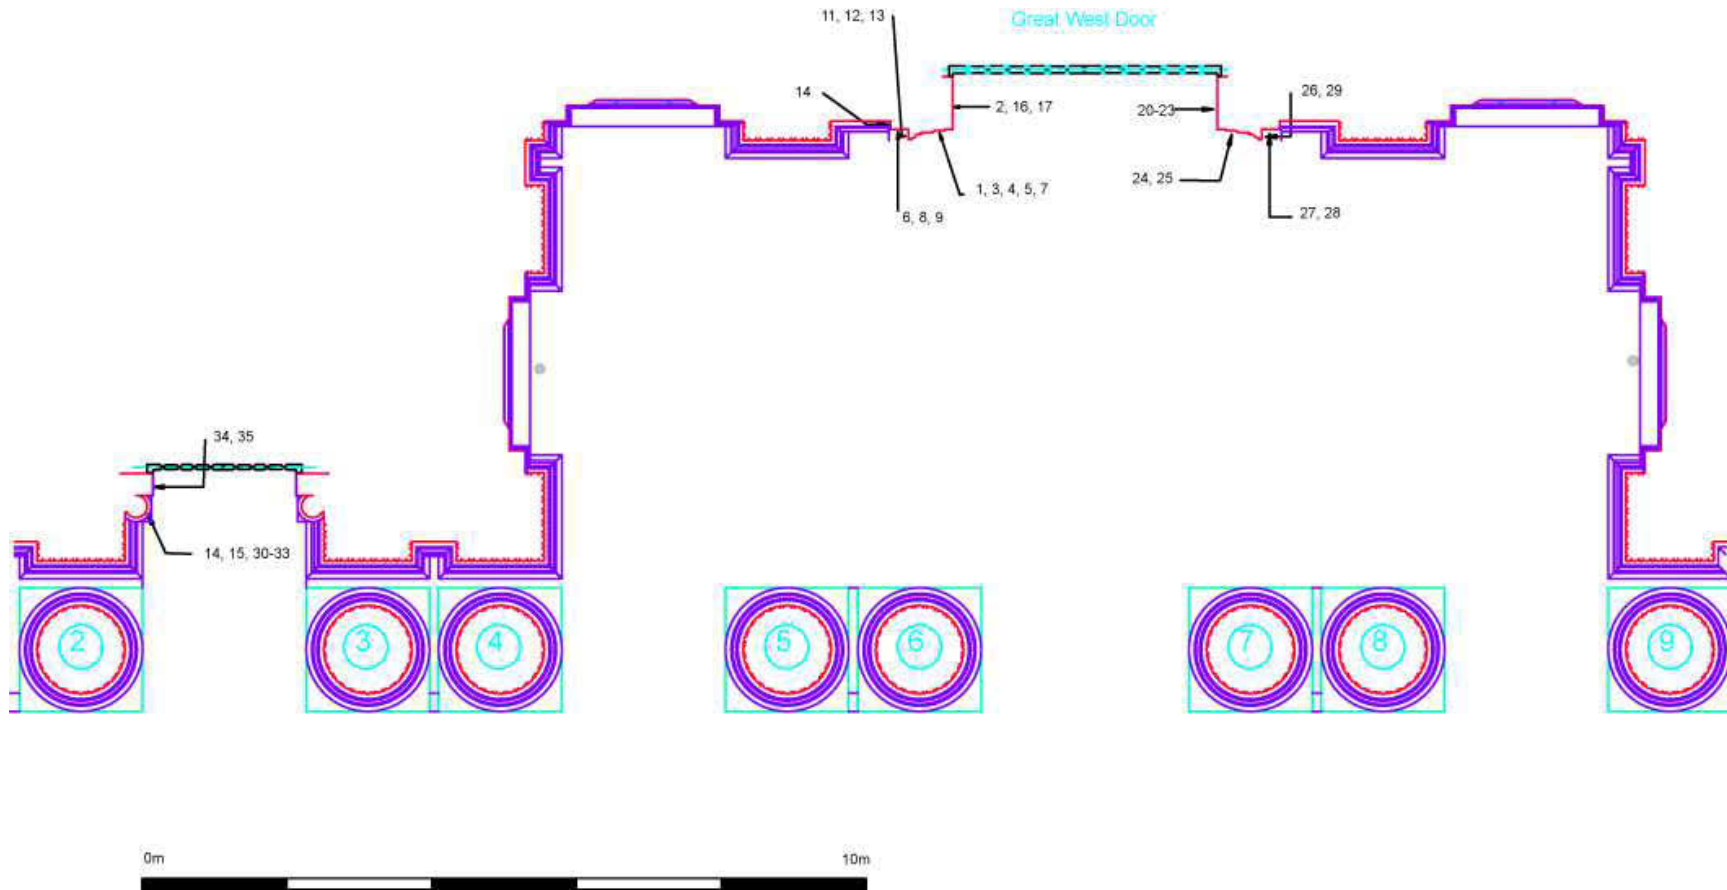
Plan of ground floor of west end outside the west doors, showing locations of photographed graffiti [based on PMT site plan 07-304]
